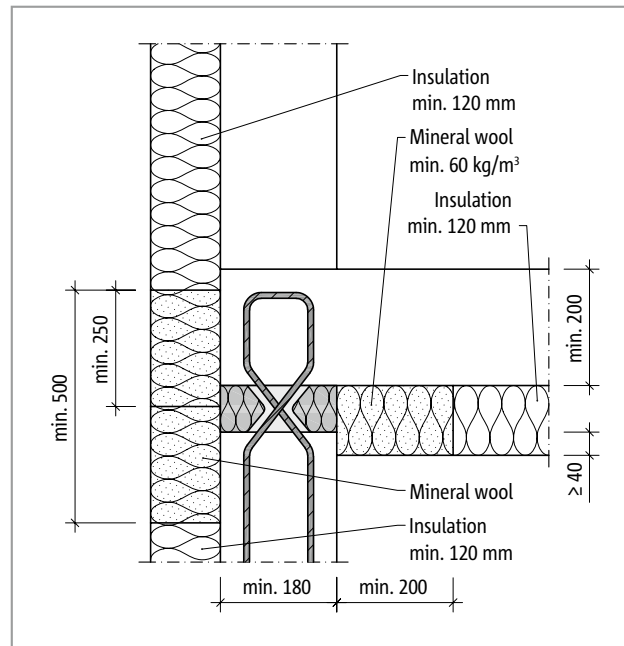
Schöck Sconnex® type W: R 120 / EI 120 with external wall and under-slab insulation
